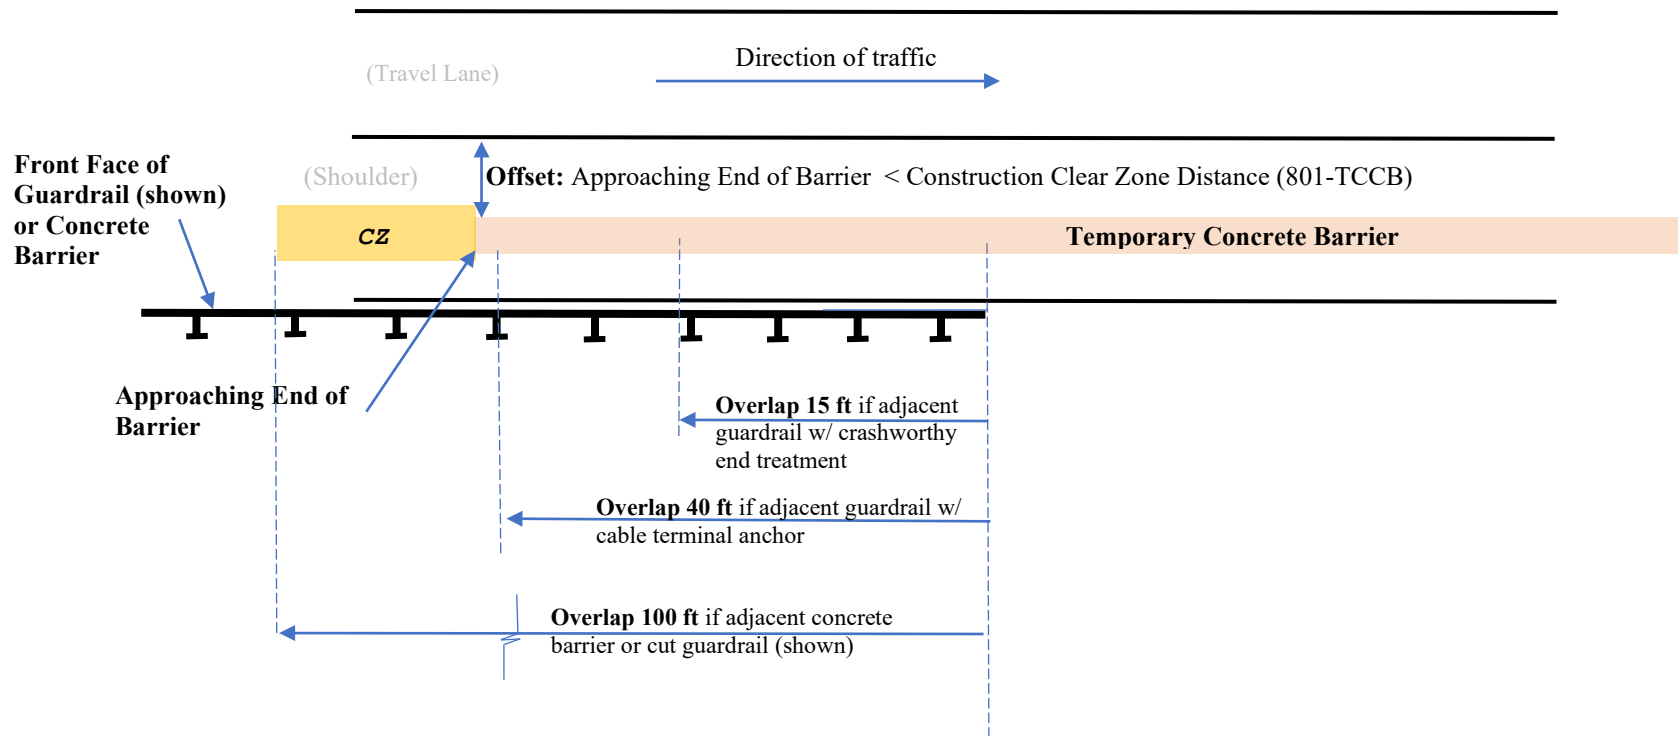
B - TTB Adjacent Concrete Barrier (Temporary or Permanent)
